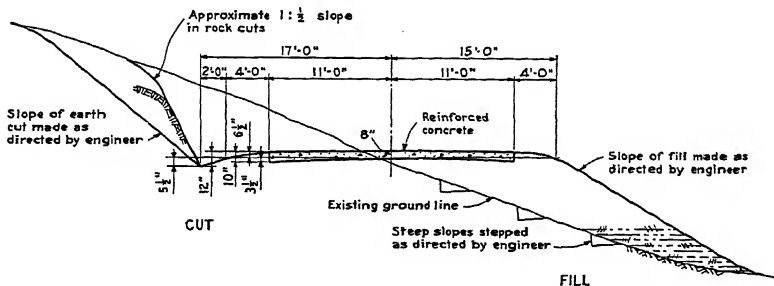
Typical cross section of the concrete heavy-duty access road.
